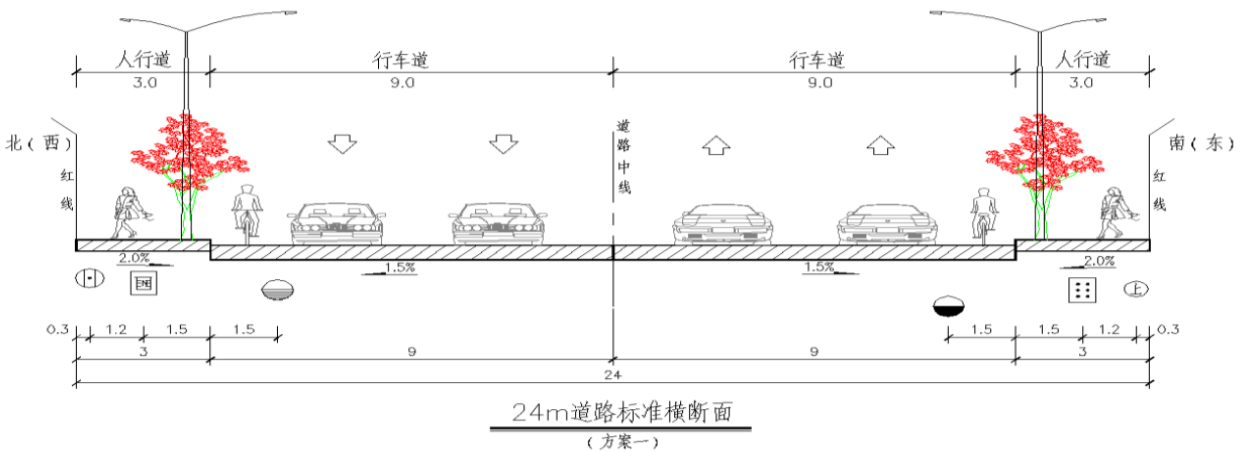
Cross-sections of No. 49 Road in Chuxiong
